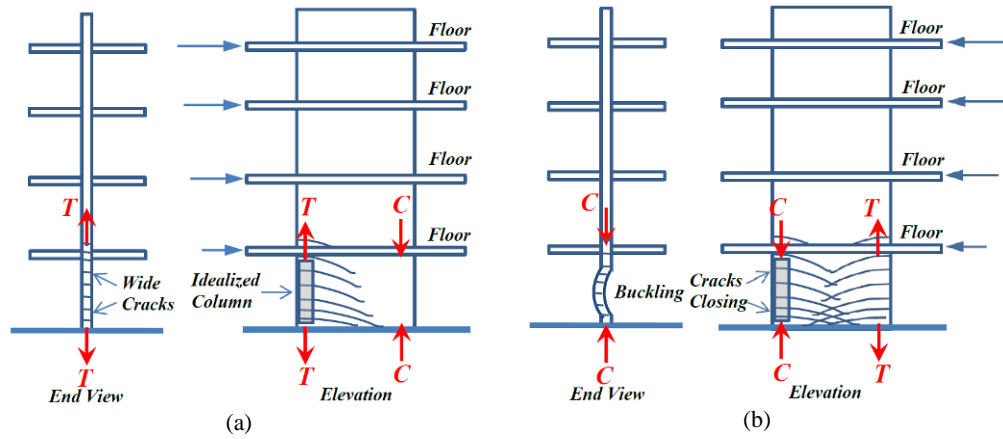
Idealization of reinforced concrete wall in end regions: (a) opening of cracks under tension cycle; and (b) closing of cracks under compression cycle, modified after Chai and Elayer (1999)
